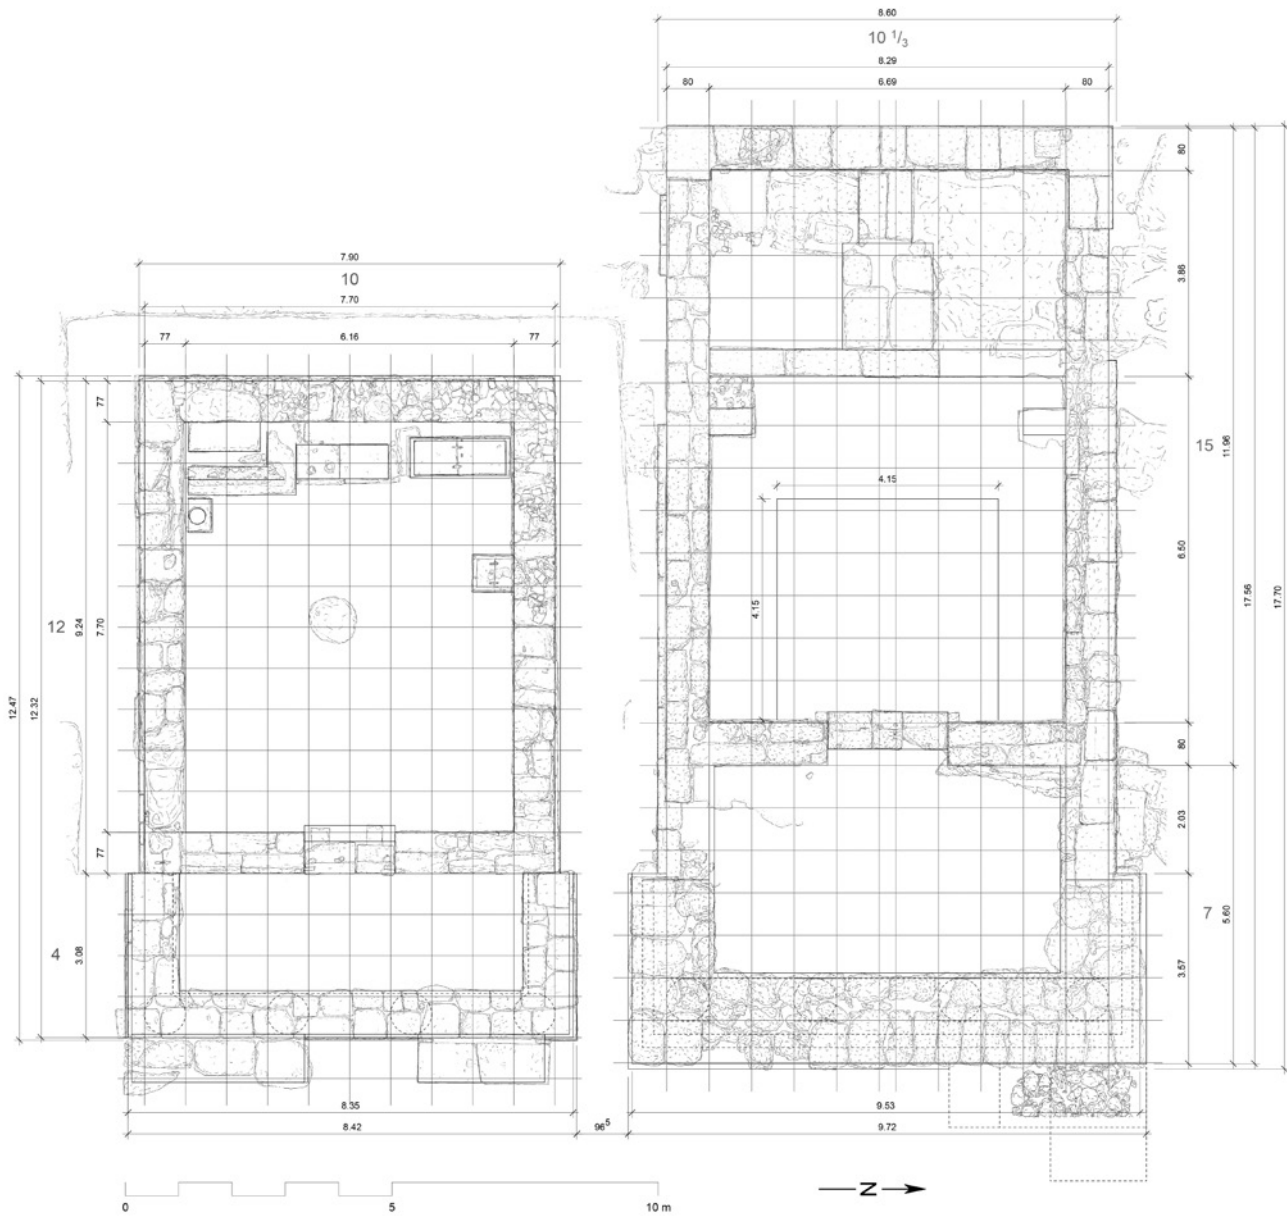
Reconstruction of the ground plans of Buildings D and E
